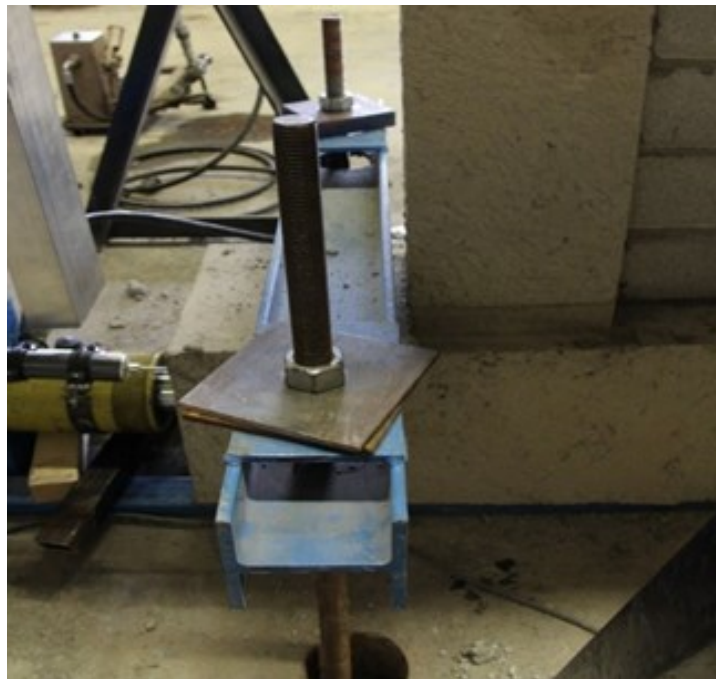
Hydraulic Jack Connection to Test Specimen
